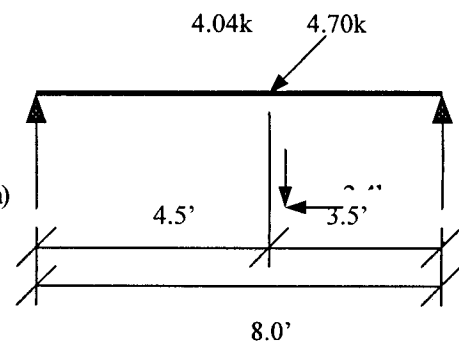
Parapet Brace Reactions at Existing 2x4 Purlin
